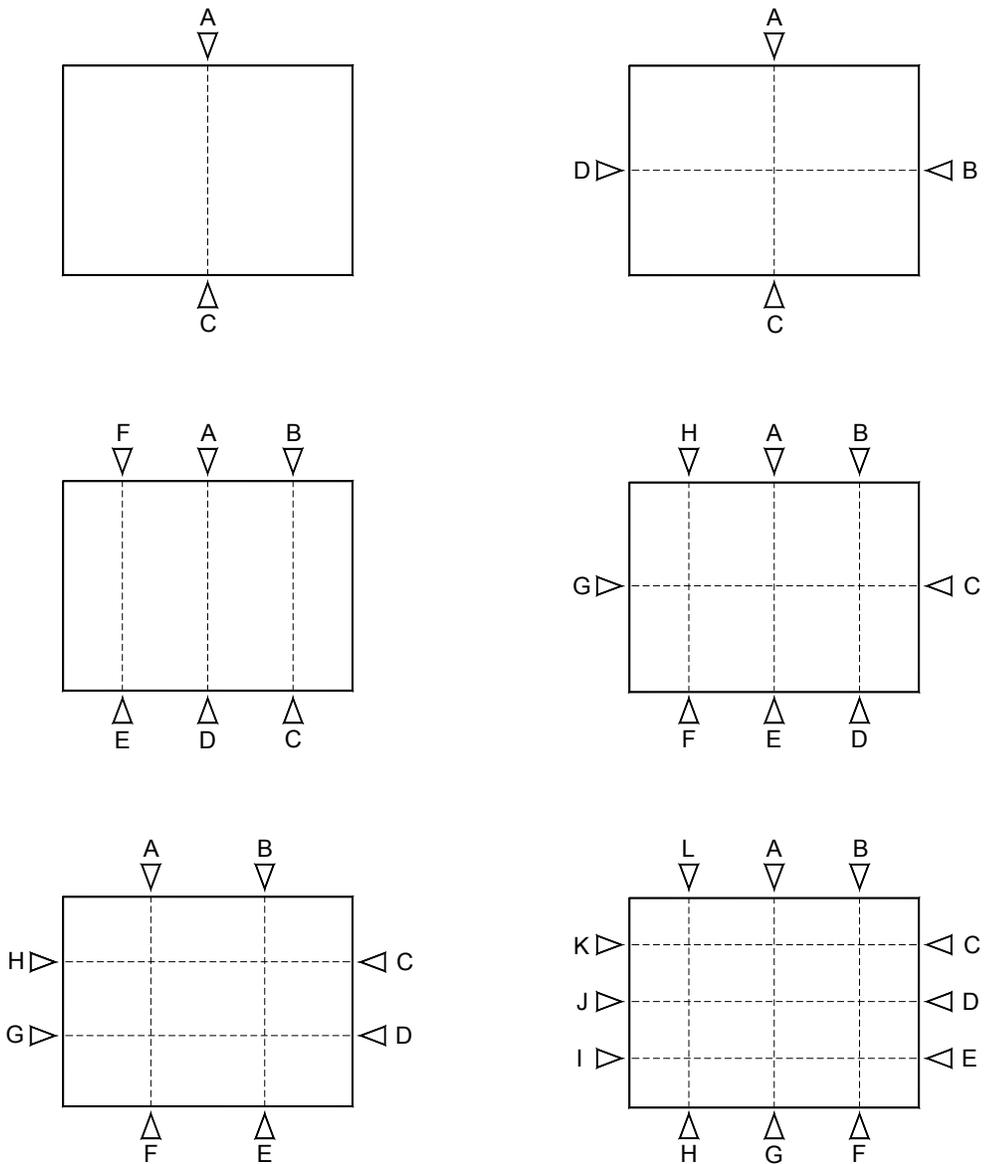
Typical Convergence Point Array Configurations Showing Anchor Designations
